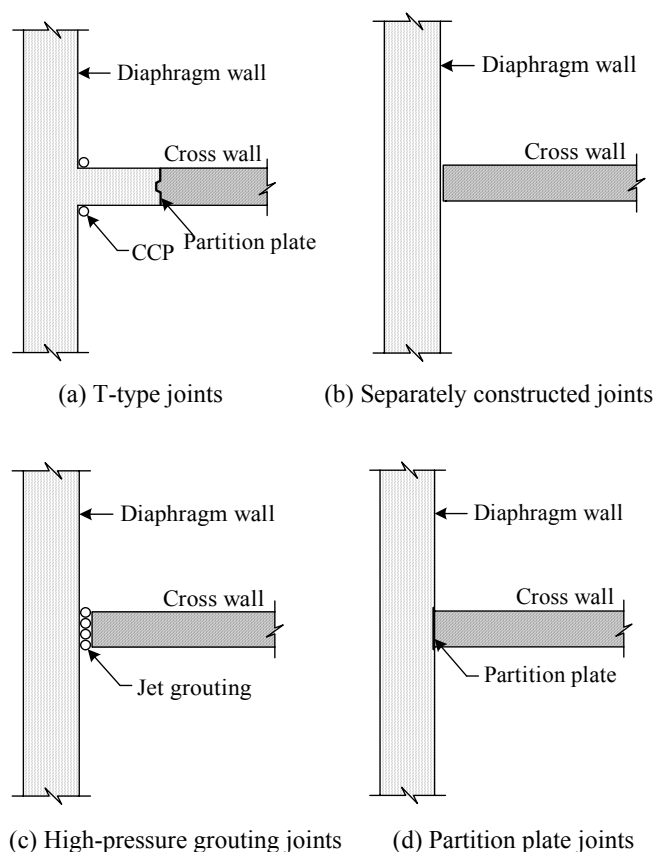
Various types of joints connecting cross walls with diaphragm walls
